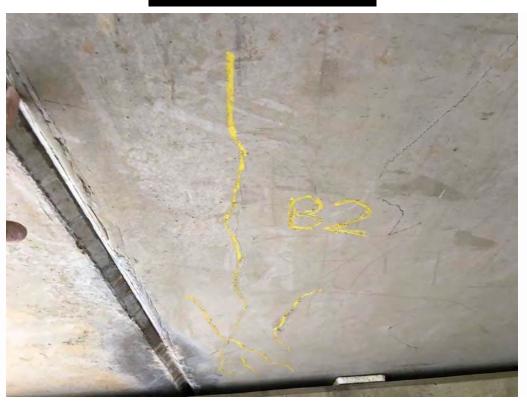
Beam 2 has hairline cracking at the west end at the south corner. (Looking west).
